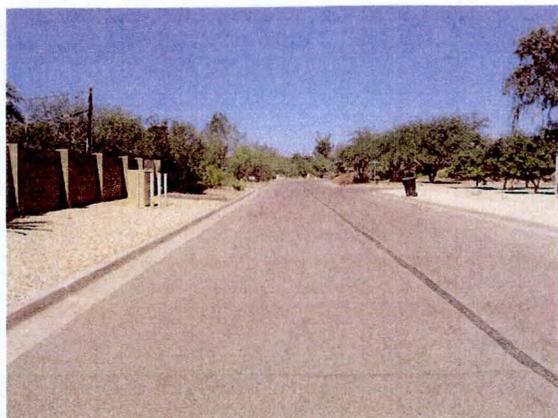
71st Street Road north of Cholla Rd (Facing North)
